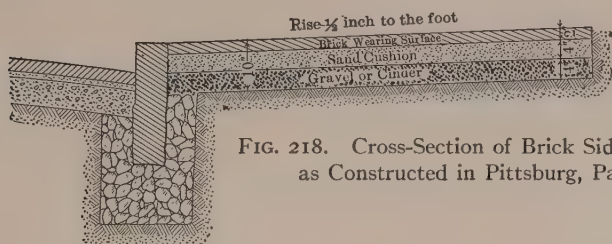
Cross-Section of Brick Sidewalk as Constructed in Pittsburg, Pa.
